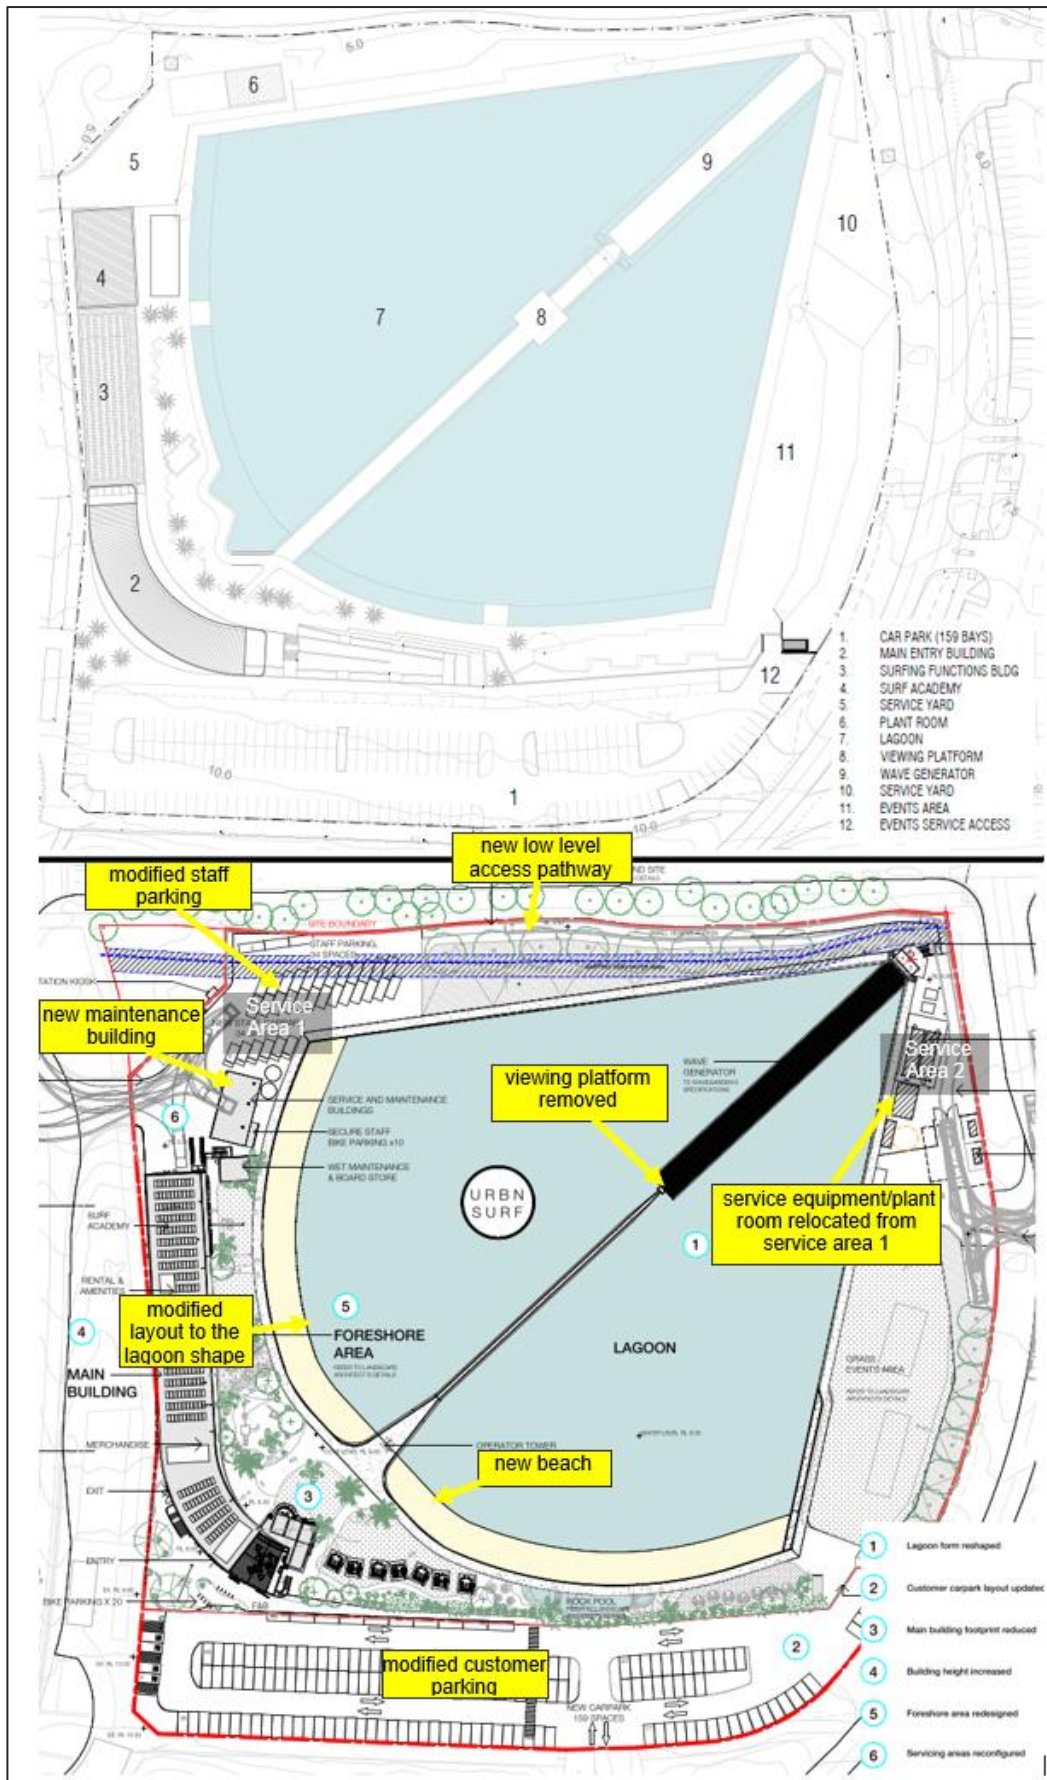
| The approved site layout (top) and proposed (bottom) (base source: Modification Report)
